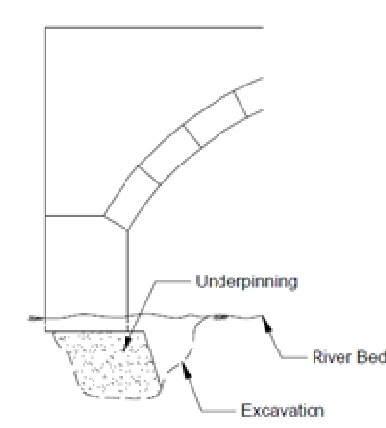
Underwater concrete grouting using an Underpinning method. (Source Dez Ab, 2011)
